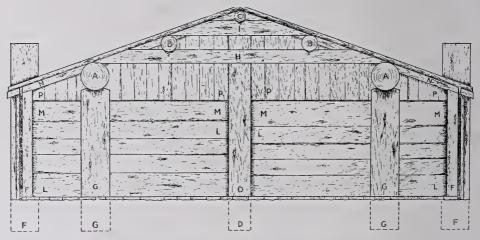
Dwelling house. Interior, rear wall and framework.
